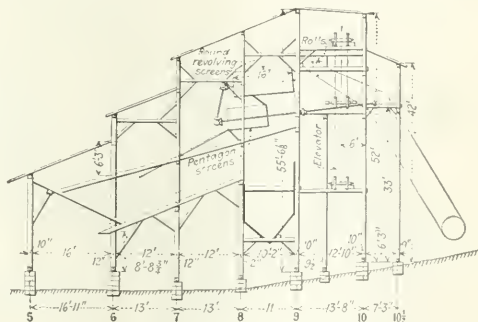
SECTION OLD FORGE BREAKER OF PENNSYLVANIA COAL CO.
